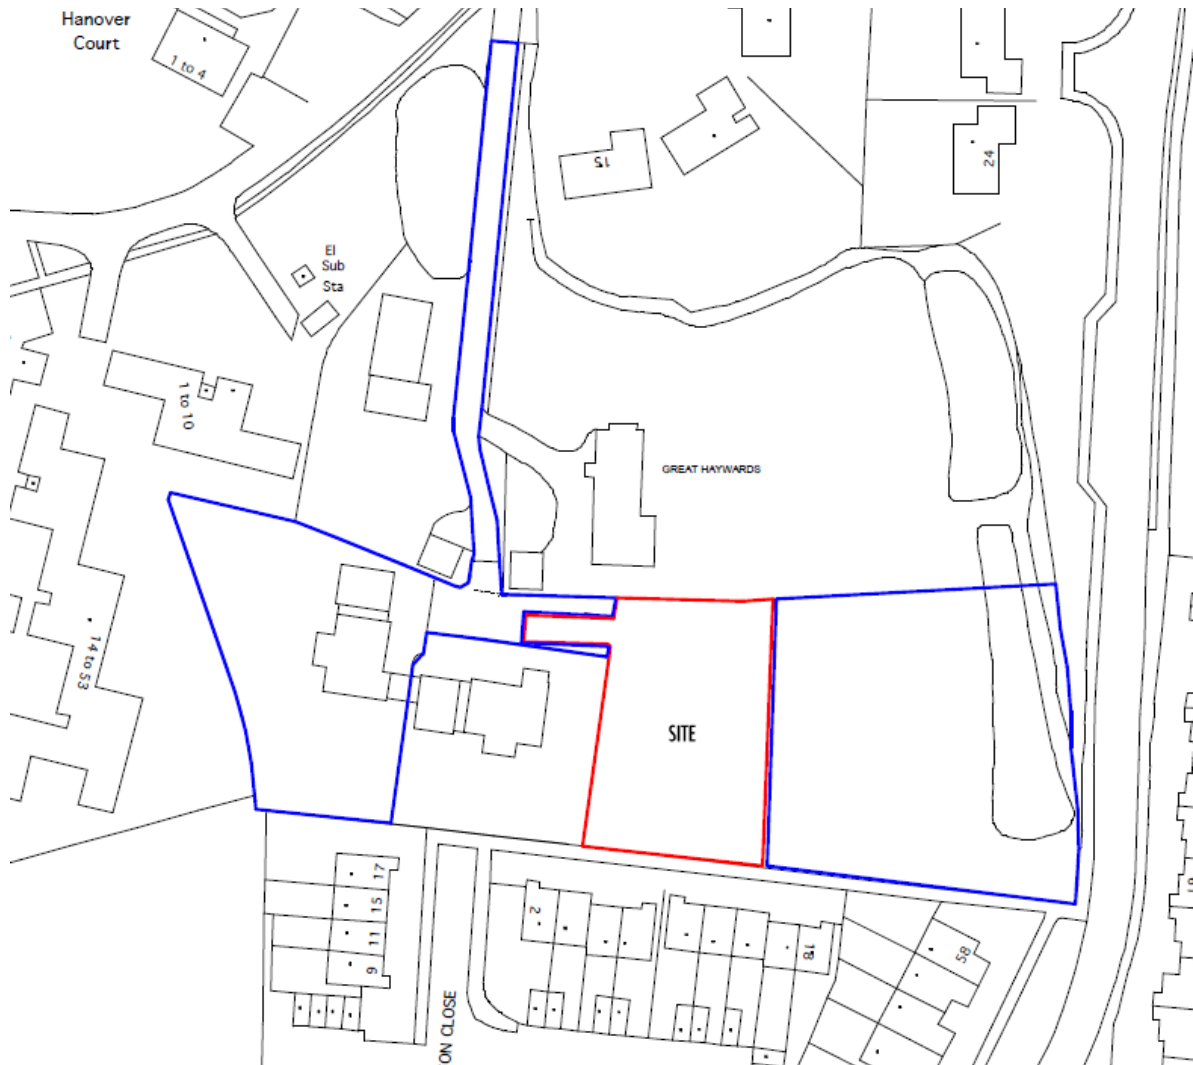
Refused Block Plan (ref: 10/02236/FUL/)
